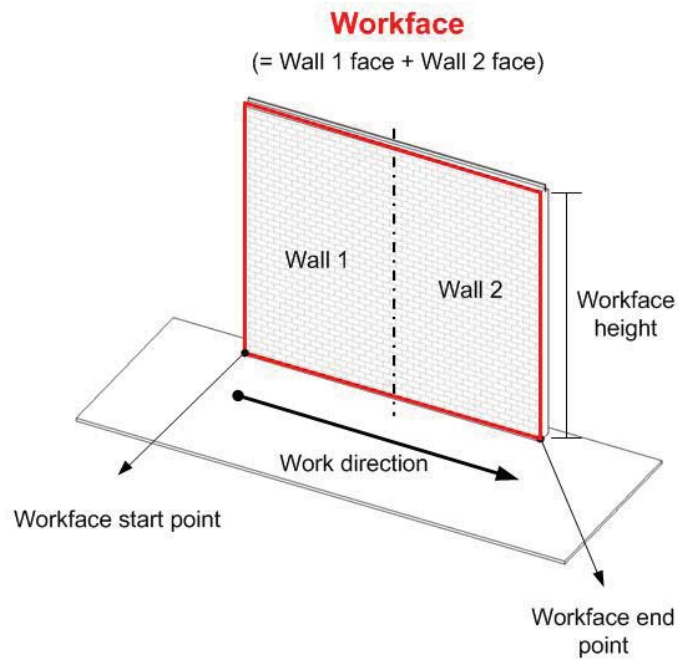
Geometric features recognized to plan scaffolding for a short masonry wall
